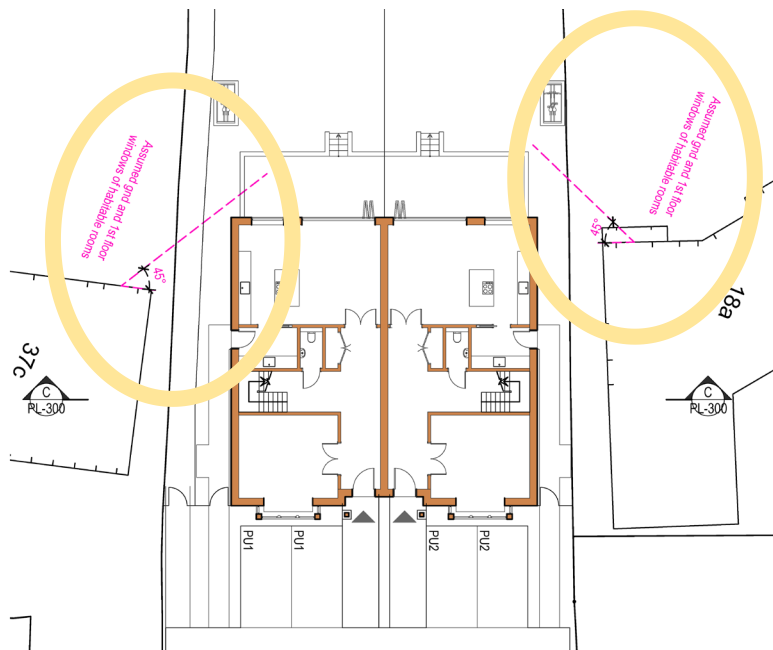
Units 3-4 on Proposed site plan– observed 45 degree ‘Rule’
